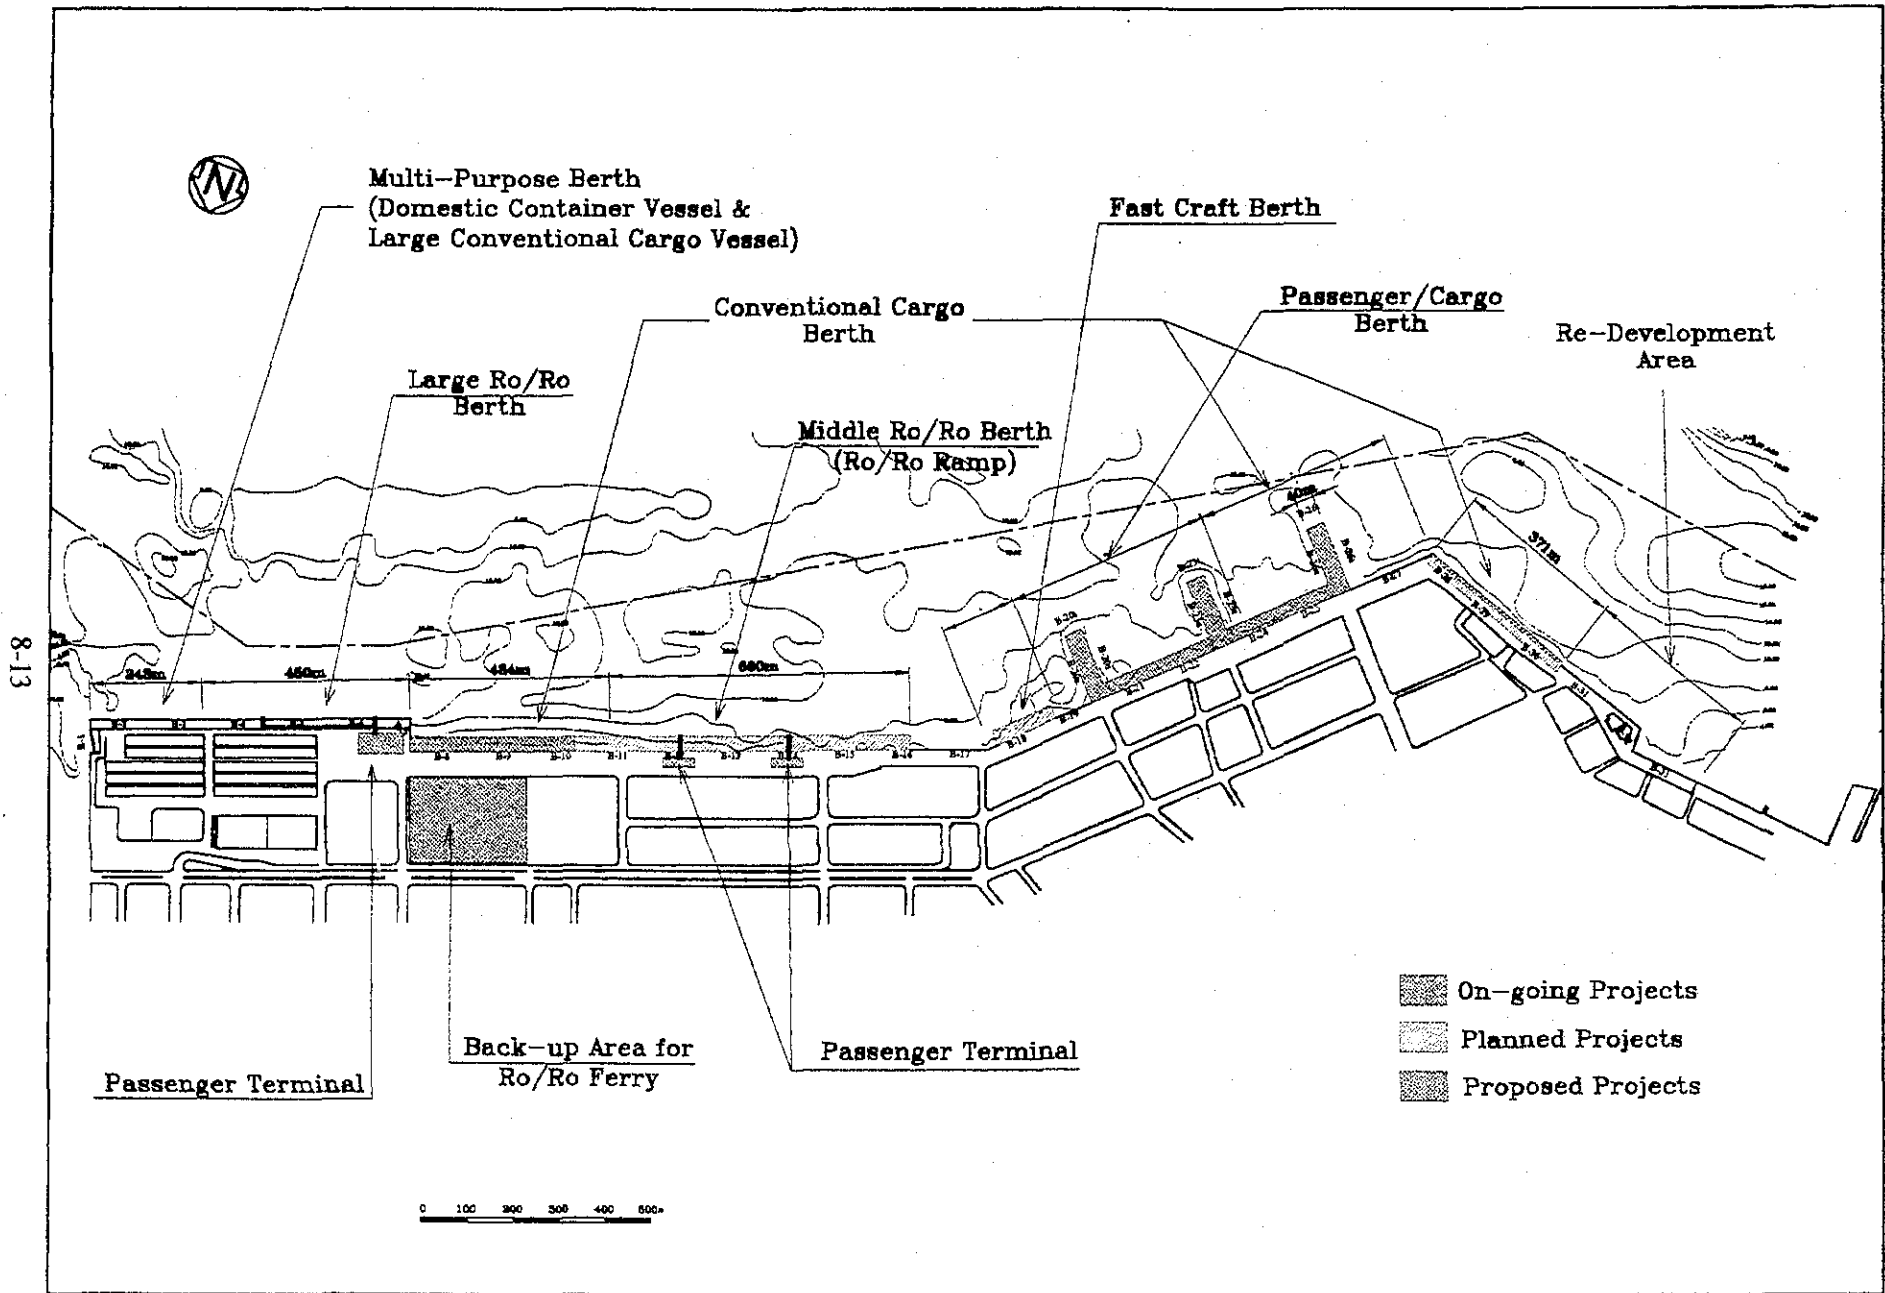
Cebu Baseport Development Plan (2010)
